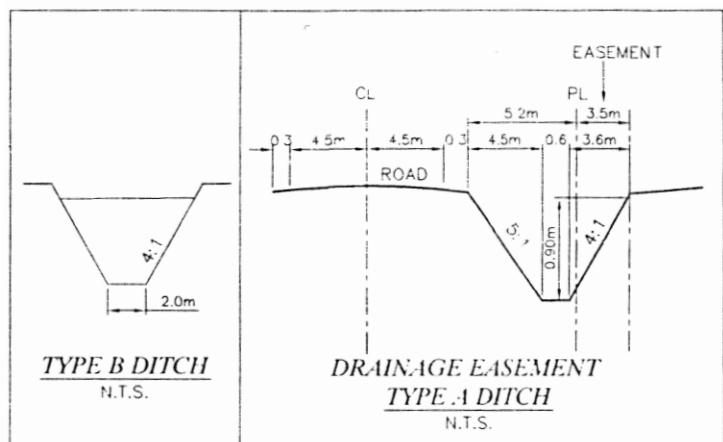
Ditch Design (Diamond Valley Industrial Stormwater Management Plan, T. Fenton, Sept 2004)
